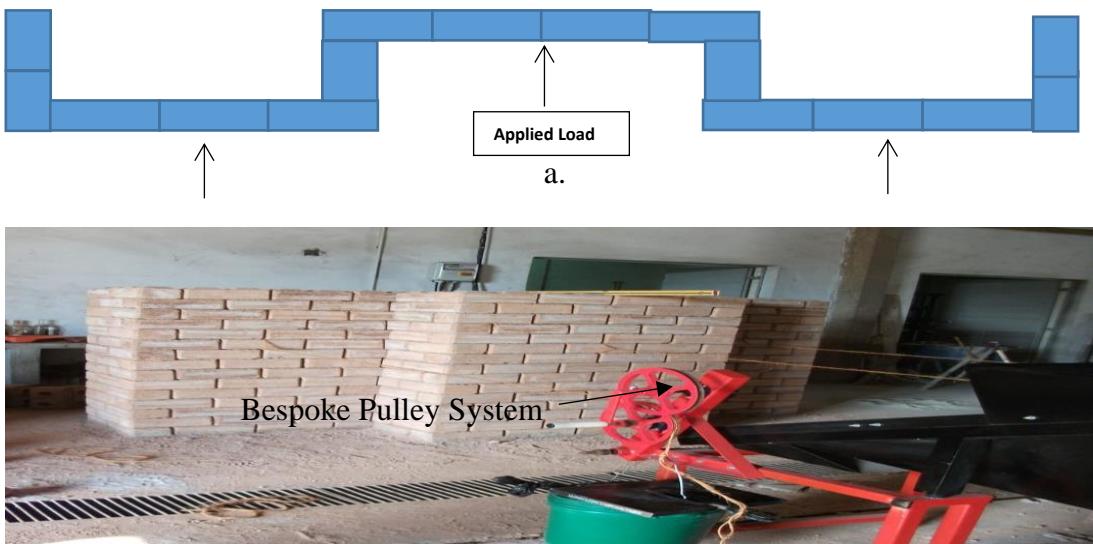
Non-straight wall testing: (a) Schematic figure and (b) Test setup displaying system for lateral load
